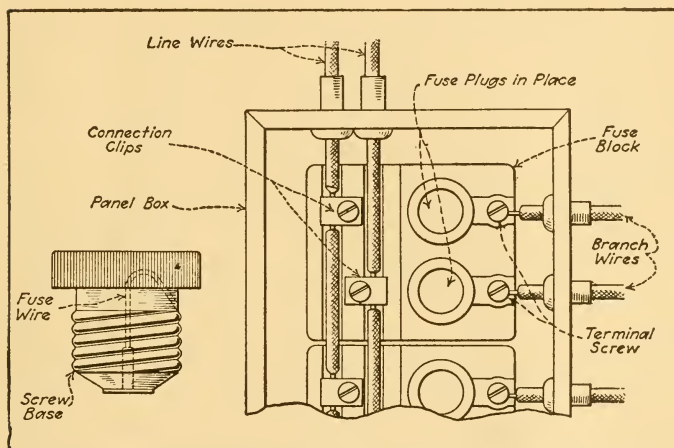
Typical Fuse Plug and Panel Box in Which It is Used.
